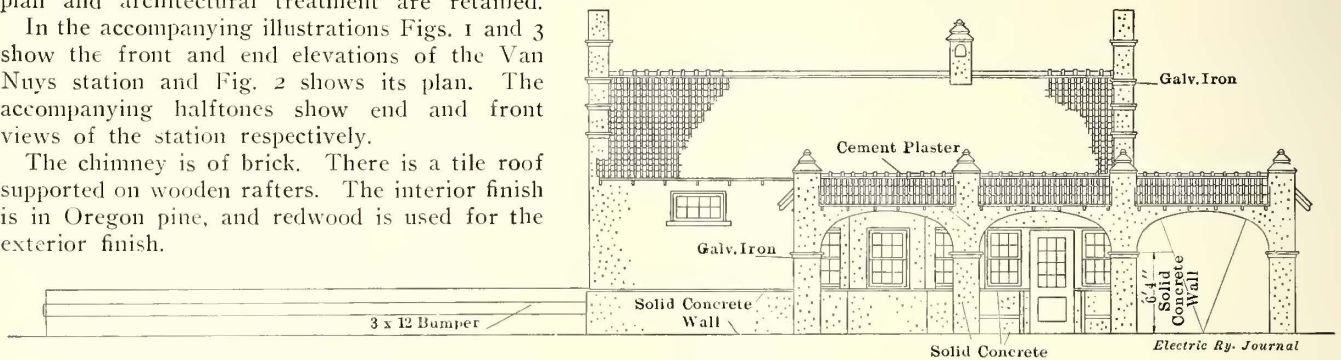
Los Angeles Stations—Front Elevation of Van Nuys Station
